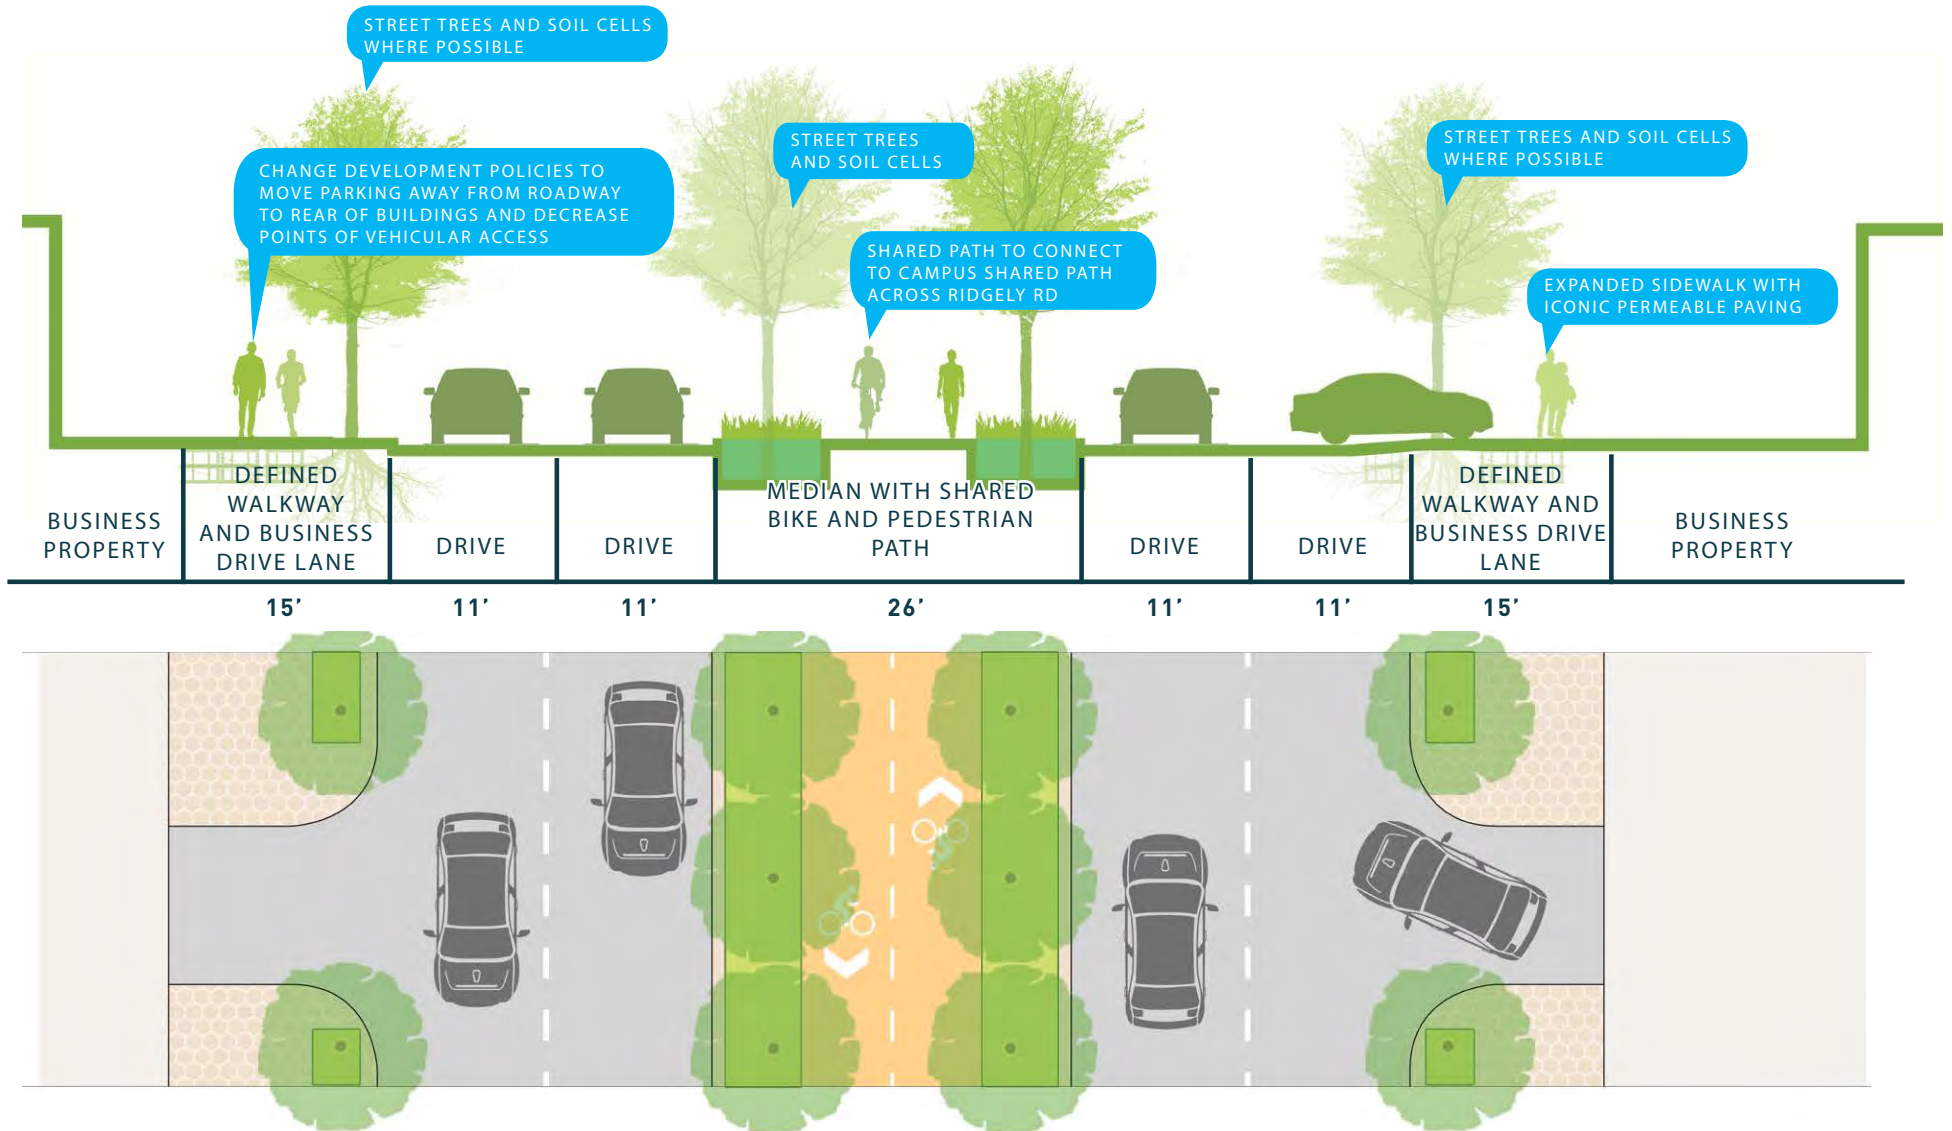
A proposed street design of International Boulevard between Tyler St. and Polk St.
